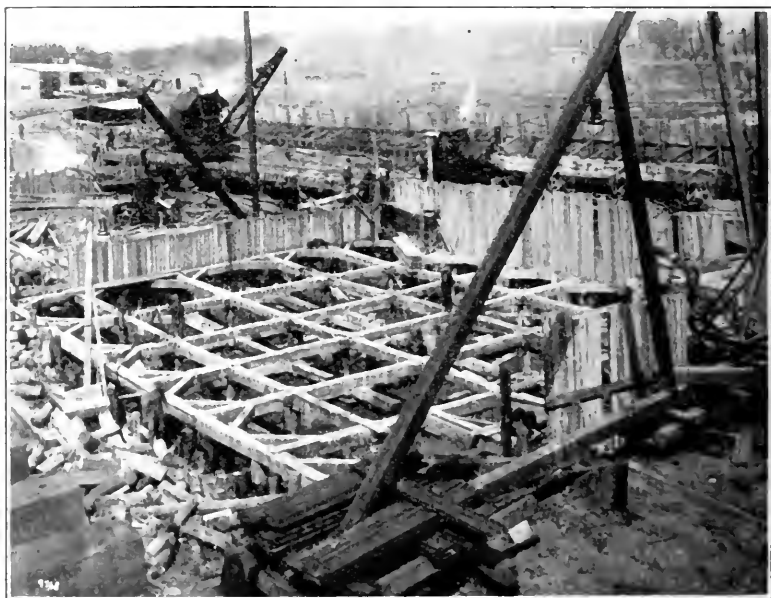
Bracing for Power House Excavation Units 6 and 7.
